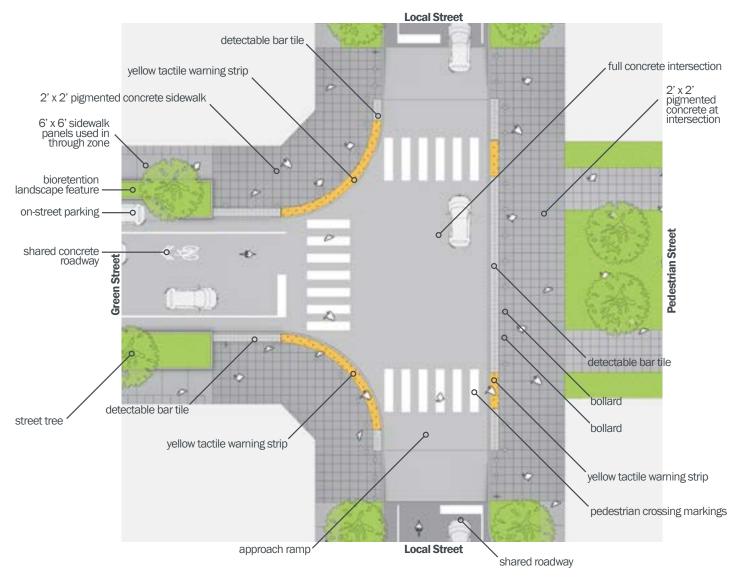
Green Street Intersection Standards. This diagram shows how a Green Street could connect to a Pedestrian Street that replaced a designated Green Street. Note: Local Streets will ramp up to meet the grade of the curbless Green or Pedestrian Street.
